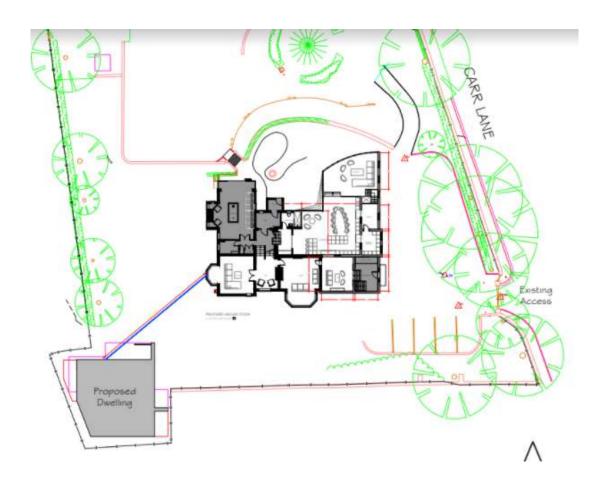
Location of proposed single dwelling in relation to the application property post redevelopment Source: Peter Hitchen Architects Not to scale
